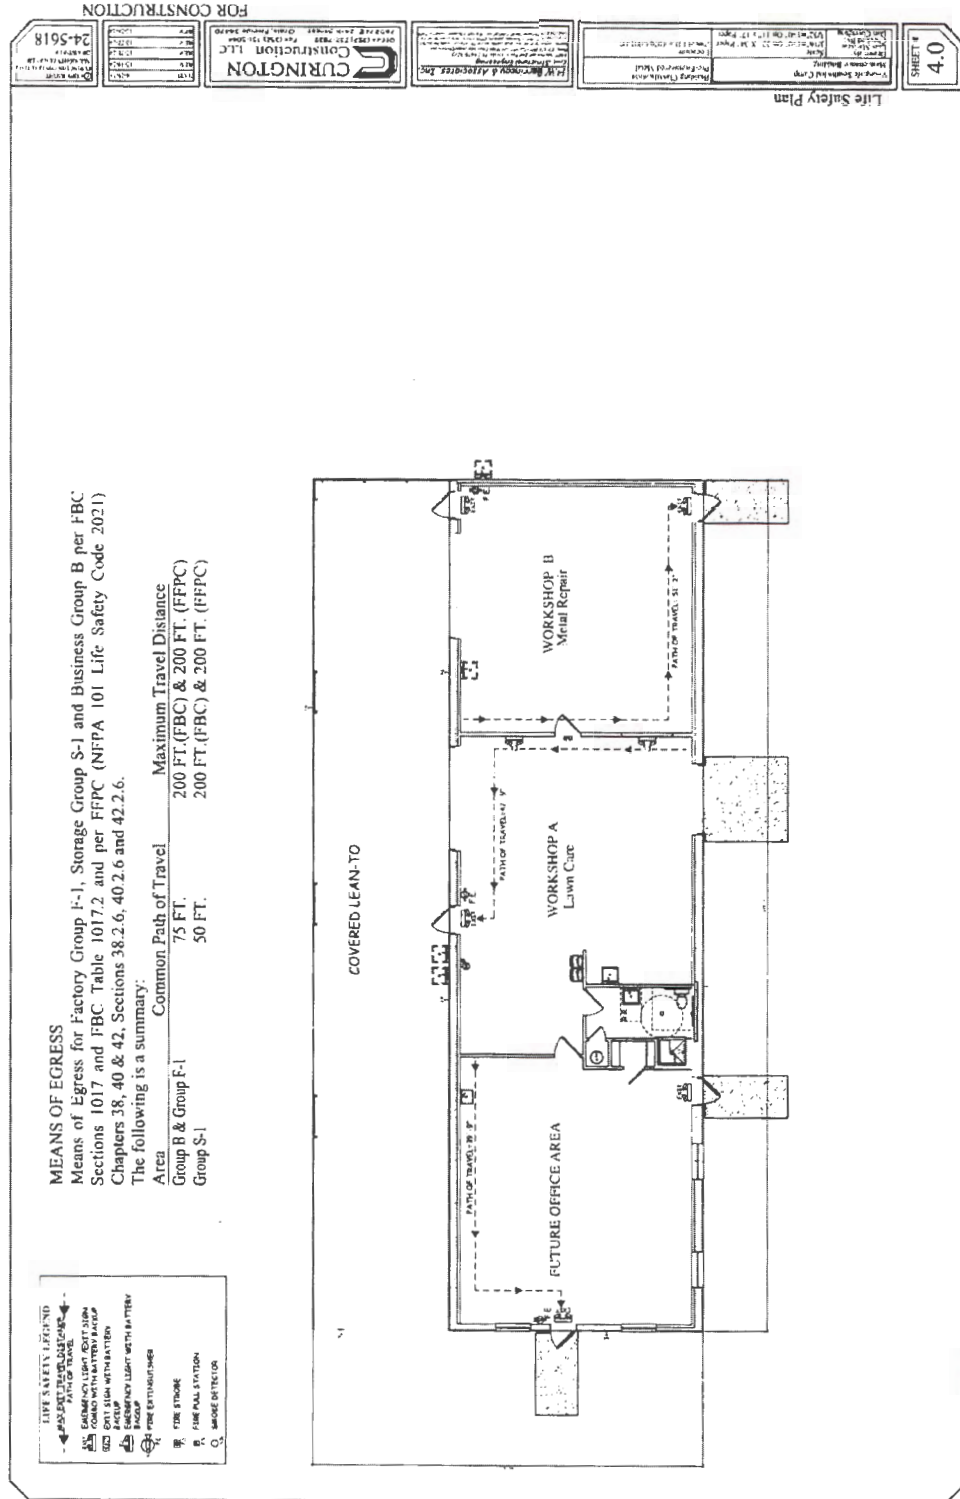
EXHIBIT "A" Resolution 25-R-470 251106SU – Plan Set
